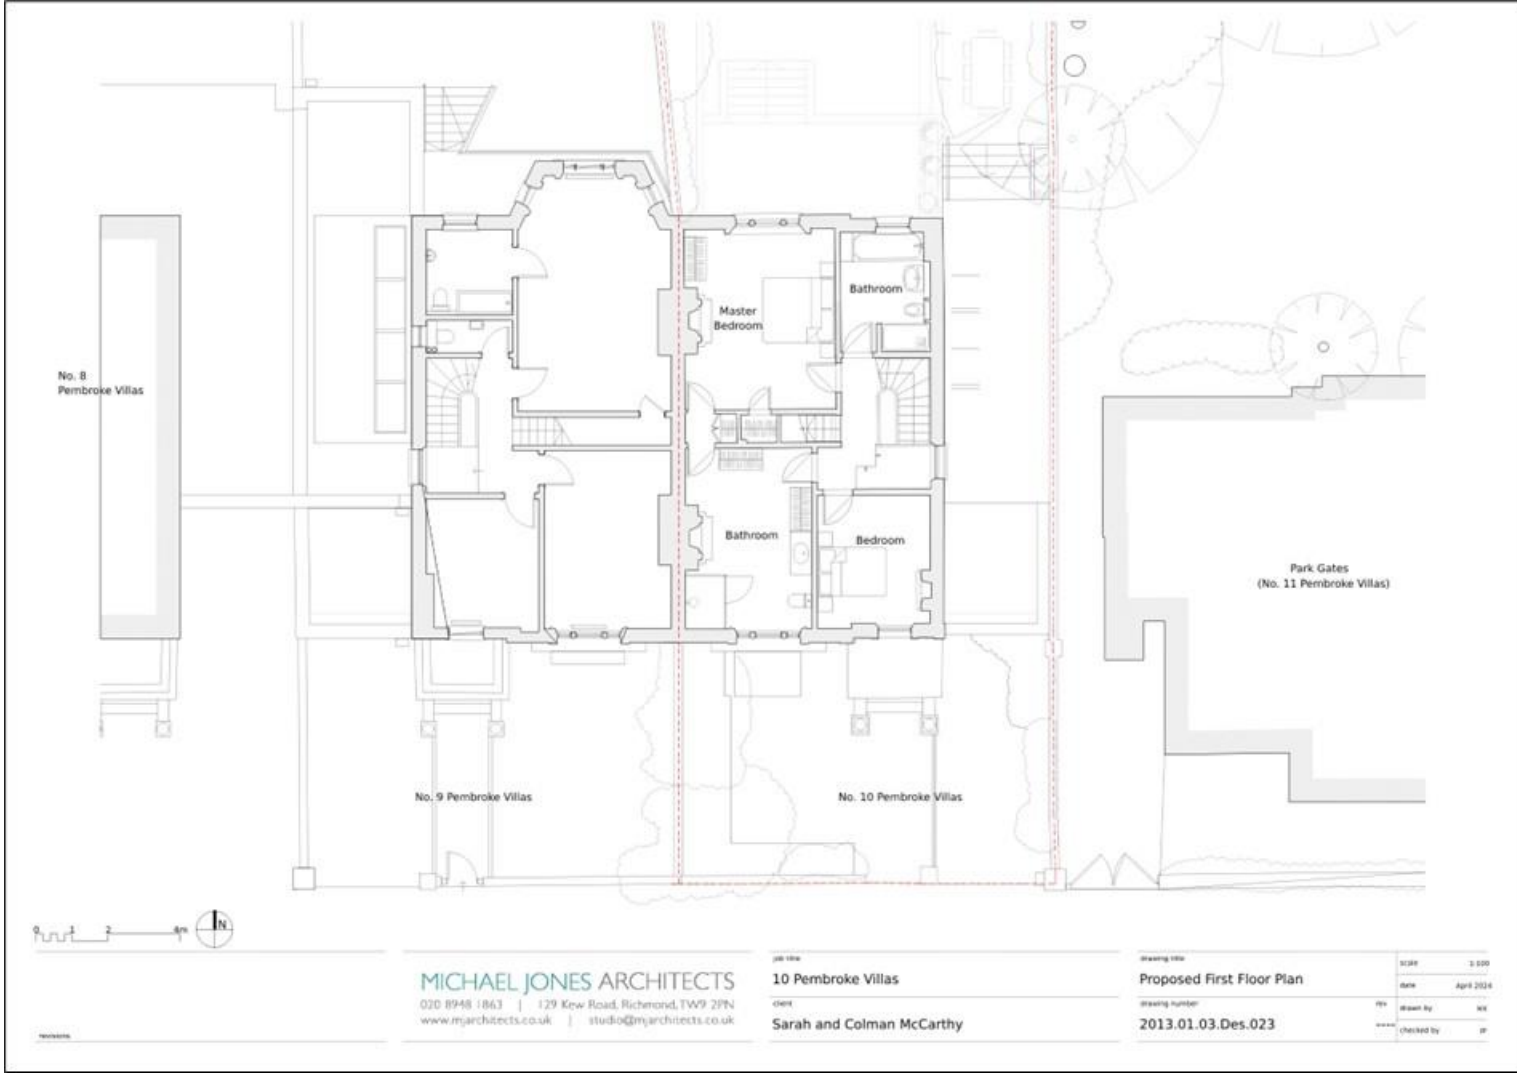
Proposed first floor plan (Reproduced courtesy of the client).
